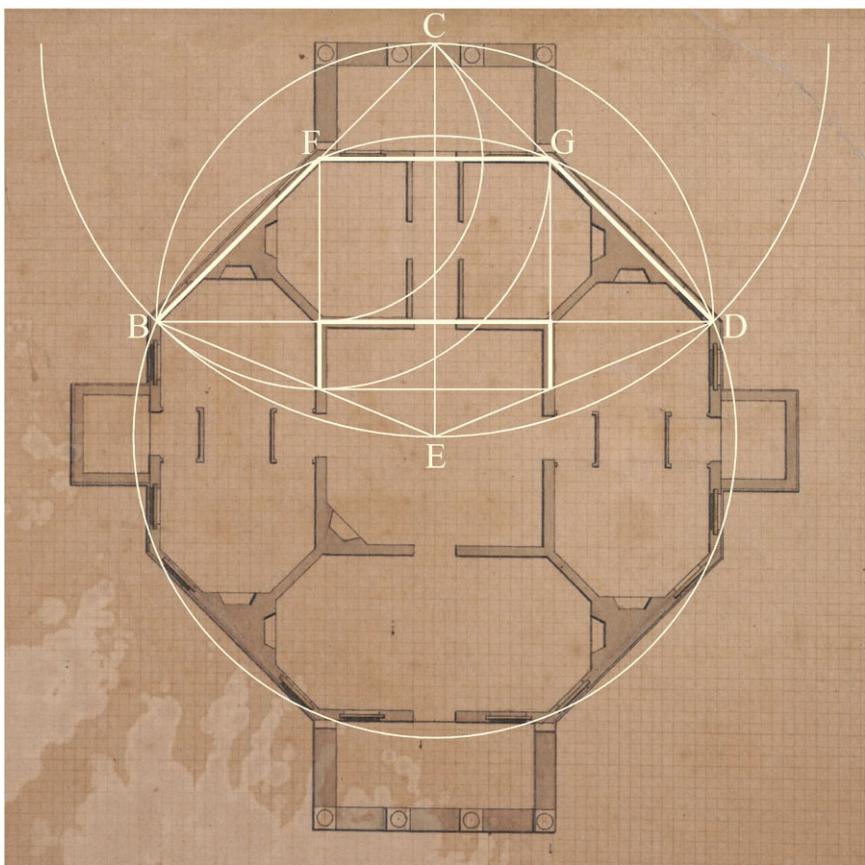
Thomas Jefferson. Poplar Forest, First Floor Plan, with geometric overlay by the author
